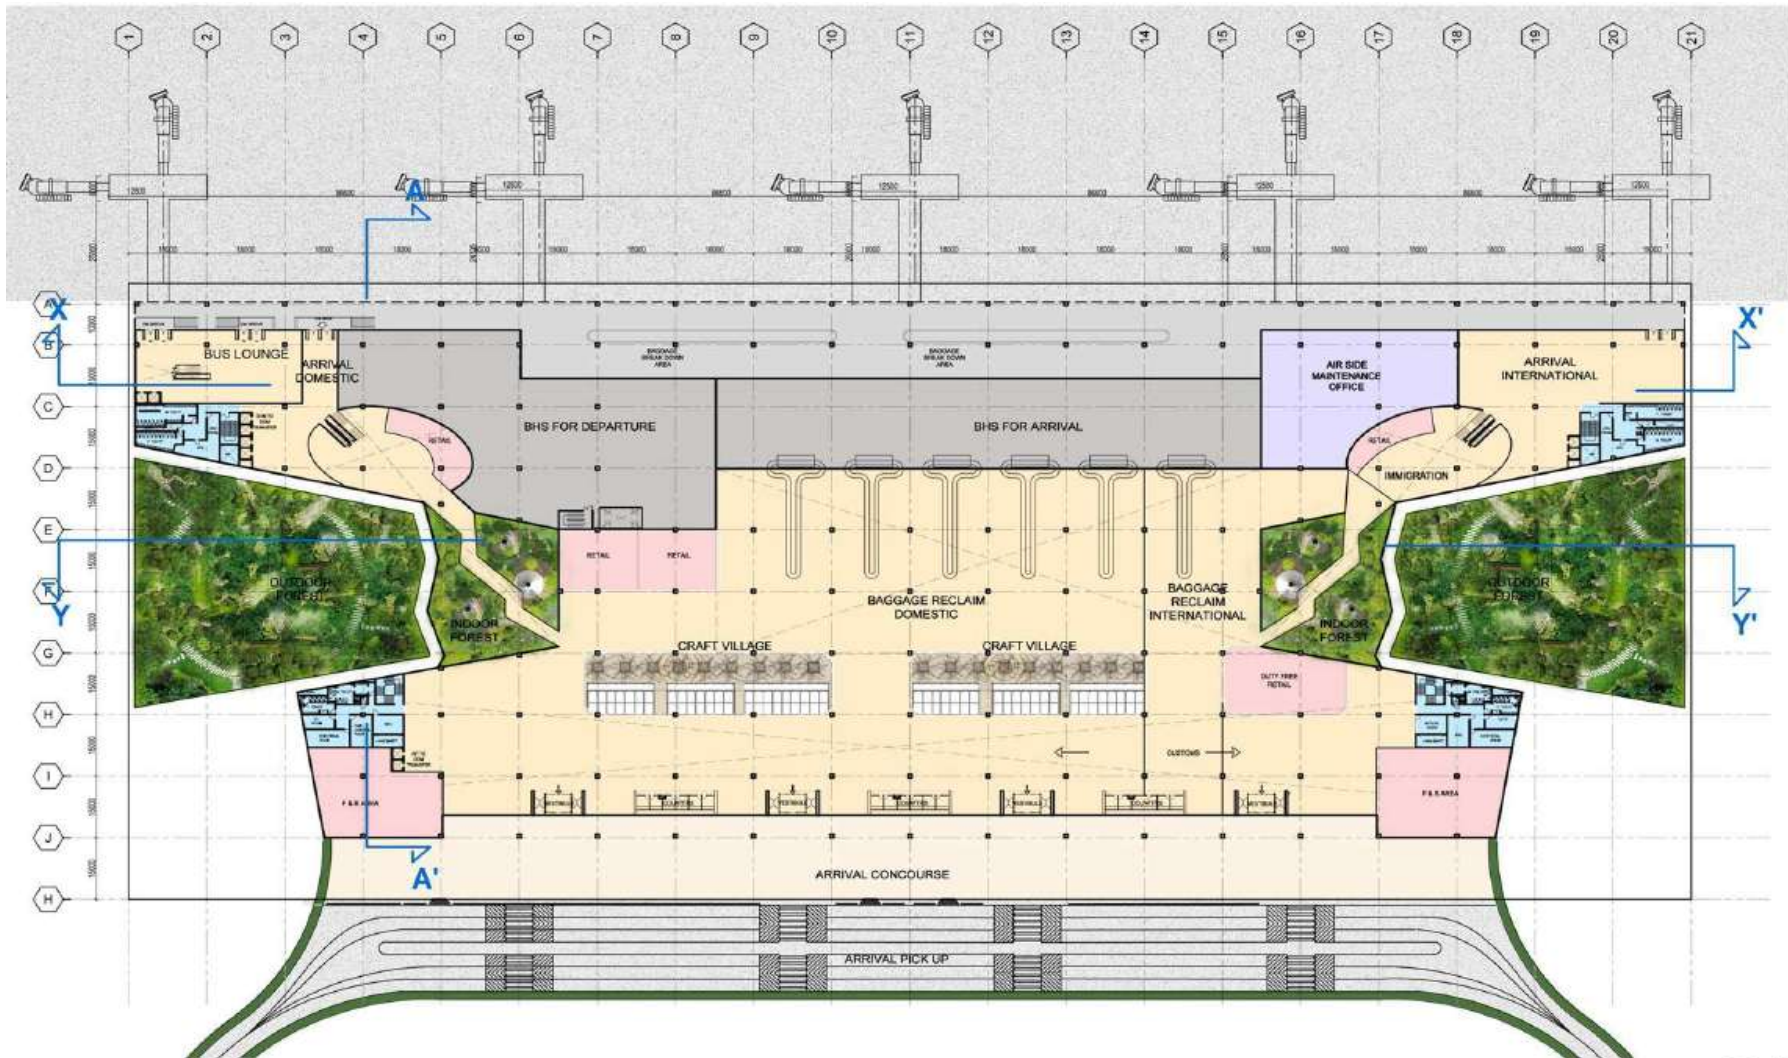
Site Plan for Arrival Side for New Integrated Terminal Building
